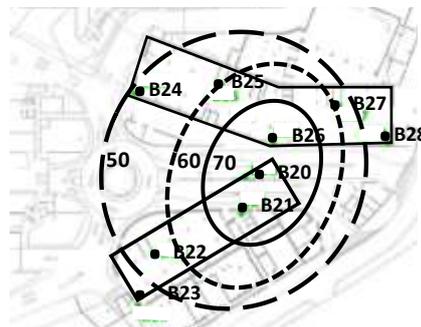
Measured settlement trough (mm) by structural load (after raft construction). Values to be multiplied by 1,4 to extrapolate to settlement at final load.
